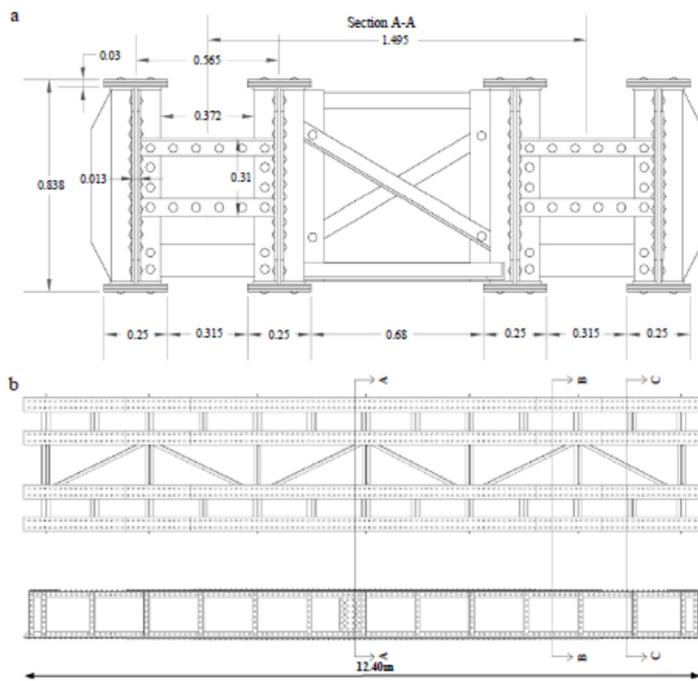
Twinned girder structure of the Meschio bridge: (a) mid-span section A-A of one lane; (b) plant and lateral view of one lane. Measures in m.
